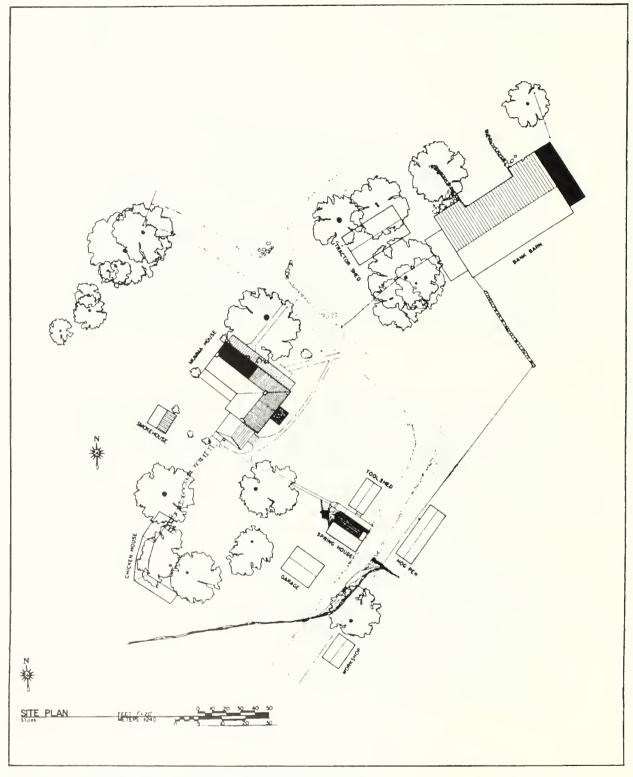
Current Site Plan from HABS] drawings, 1987-1988.
